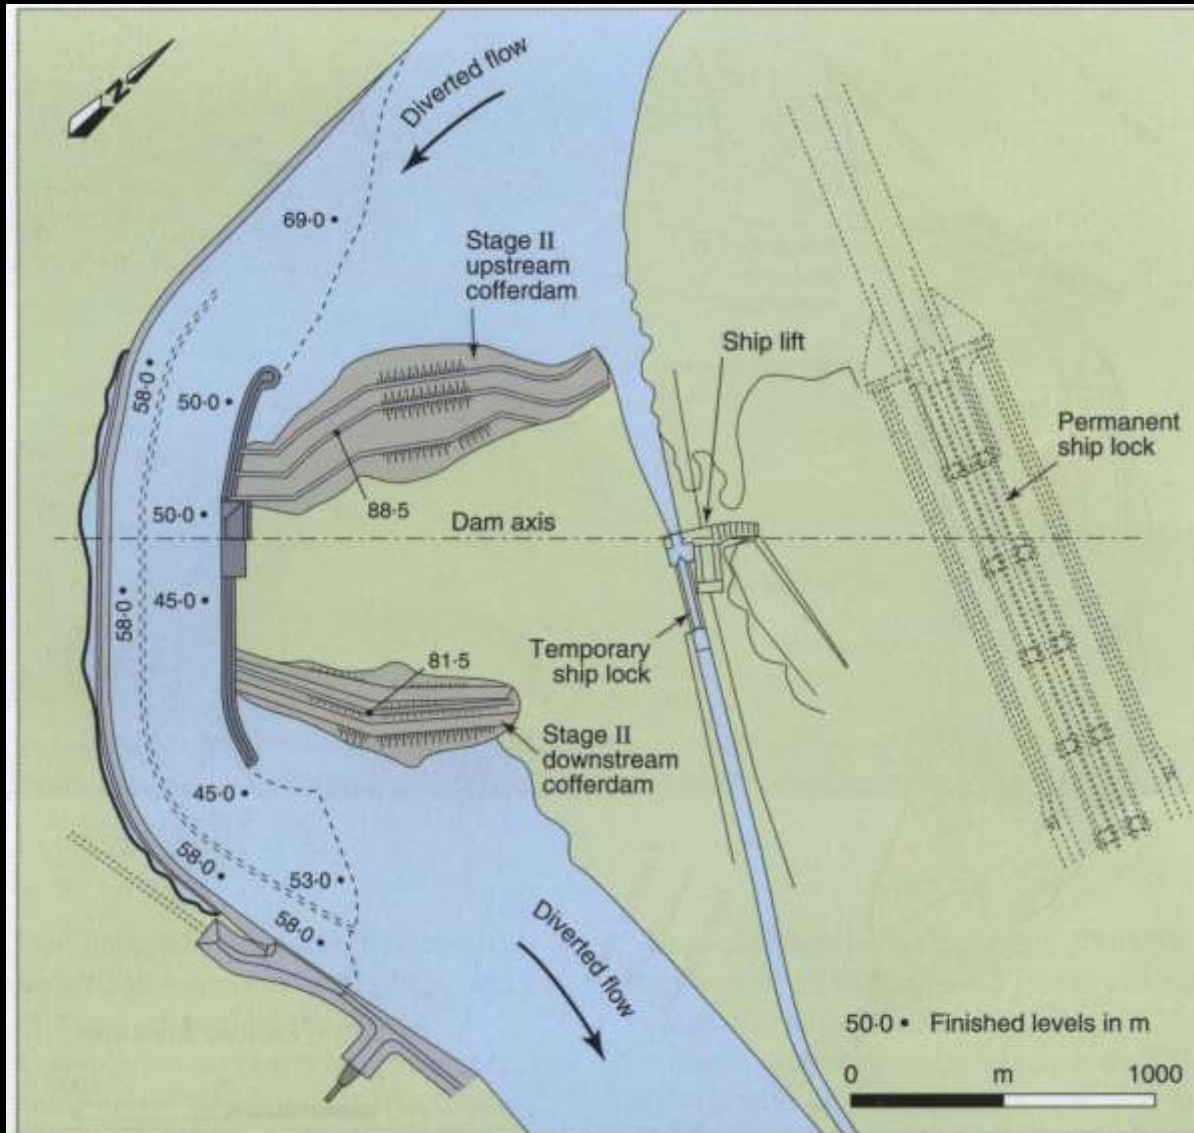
Plan of second-stage cofferdams, which enabled construction of the north side of the dam to start
